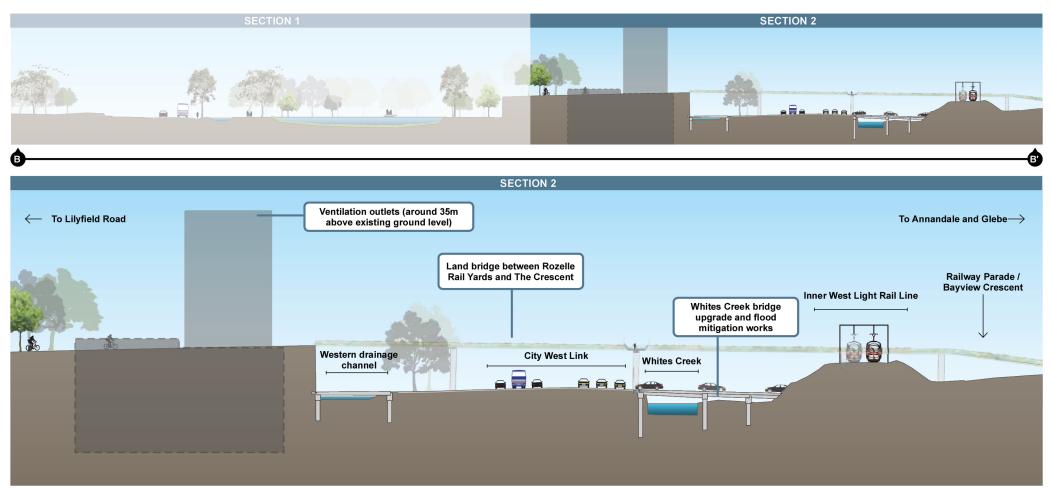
Long-section of the Rozelle Rail Yards - north-south - section 2
